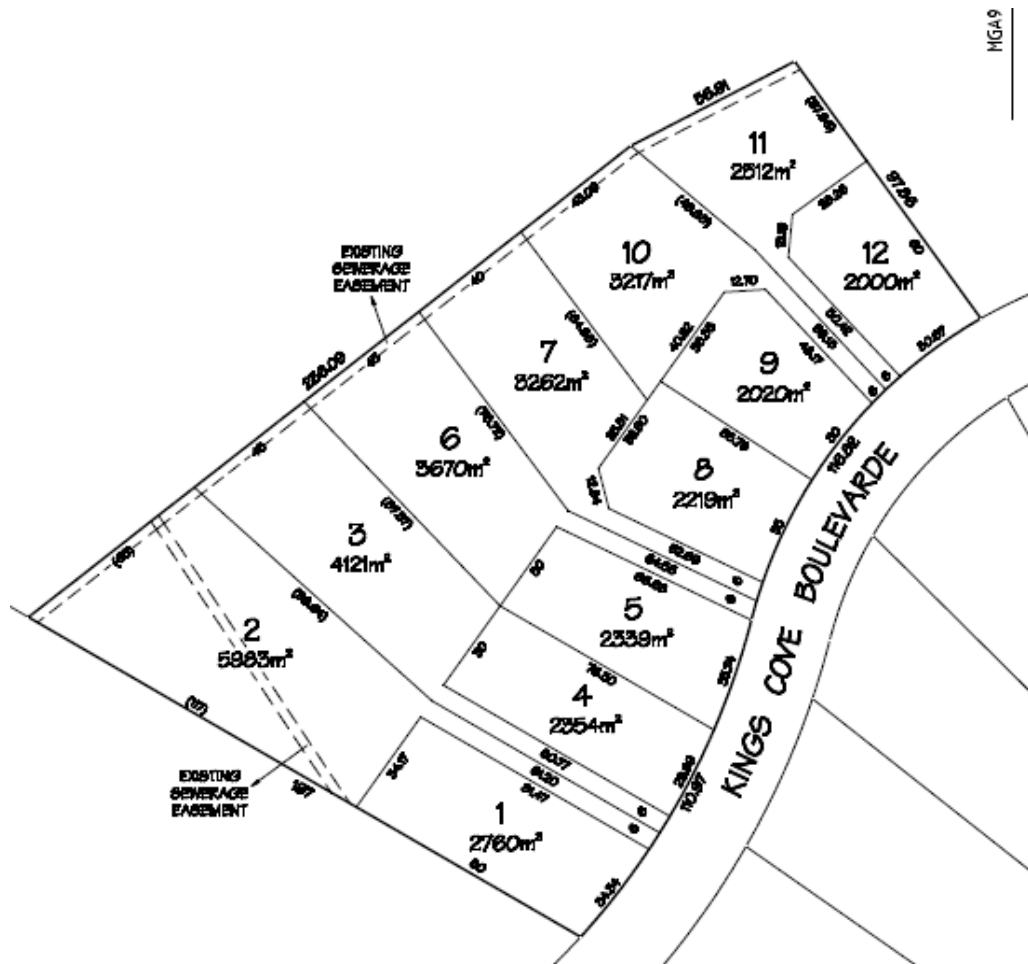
Proposed Plan of Subdivision (Source: Crowther & Sadler, Version 2, Drawn 12/11/2020)
